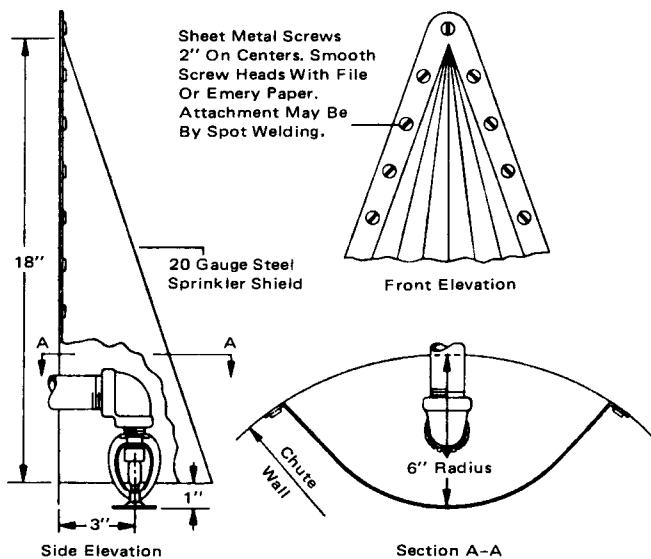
Canopy for protecting sprinklers in building service chutes.
